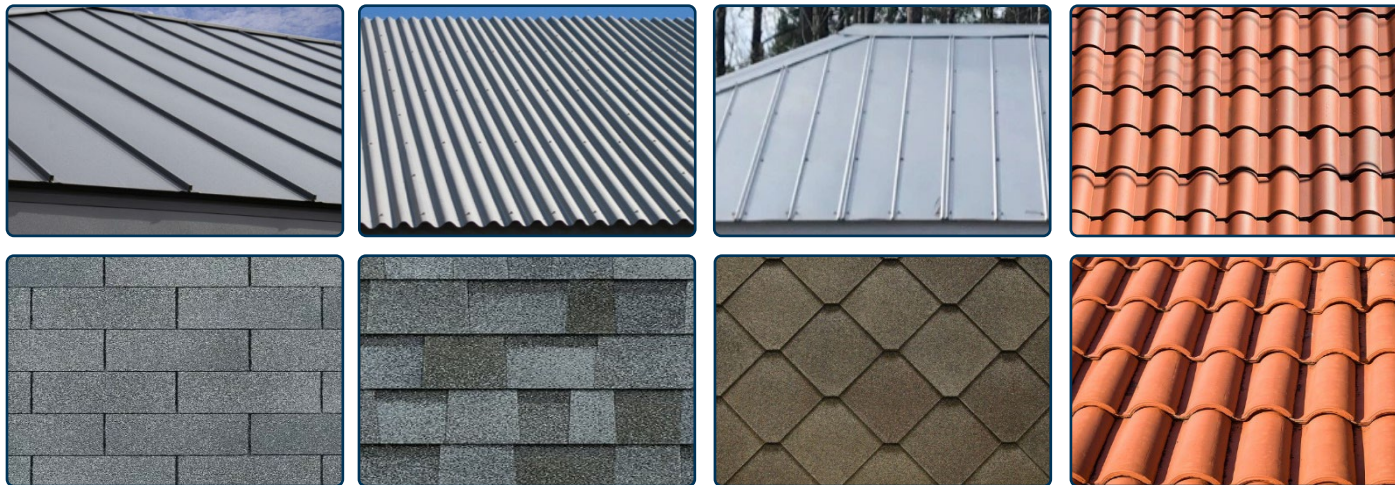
Examples of common and replacement roofing materials. Clockwise: standing seam metal, corrugated metal, 5v crimp metal, decorative metal, terra cotta, diamond shaped luxury asphalt shingles, architectural asphalt shingles, and three-tab asphalt shingles.
